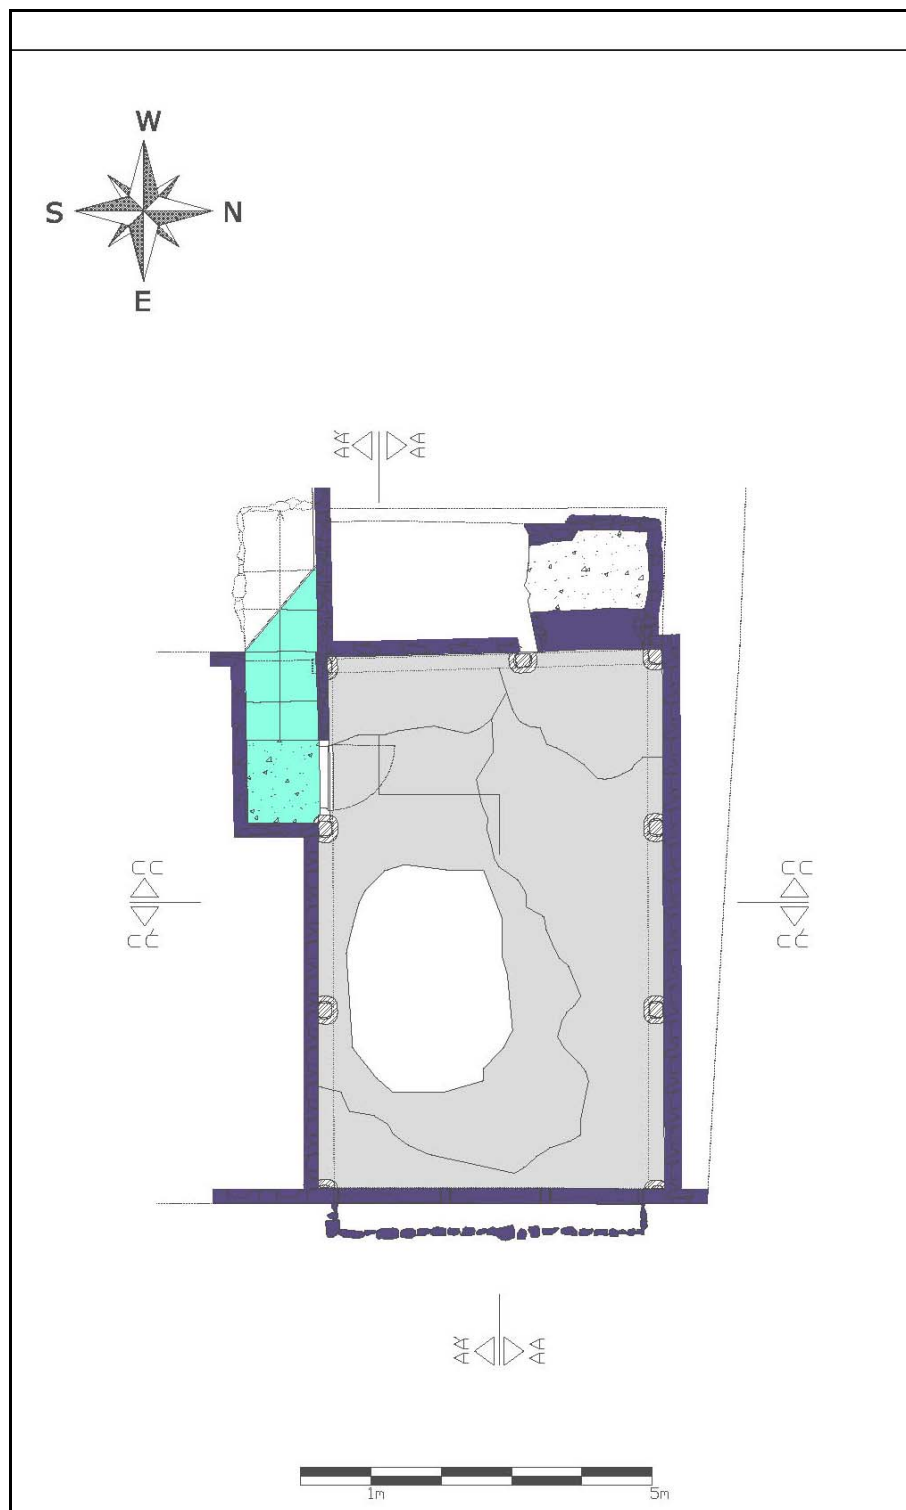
Analysis of Str. Syst. & Const. Tech.; Basement Floor Plan; Scale: 1/100 (presented in 1/50 at Jury)
